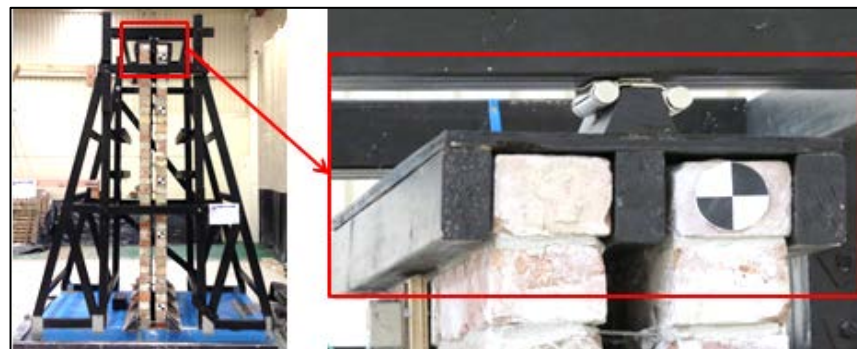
Close up of typical top wall boundary restraints for walls W1 and W2, showing rotating hinge
